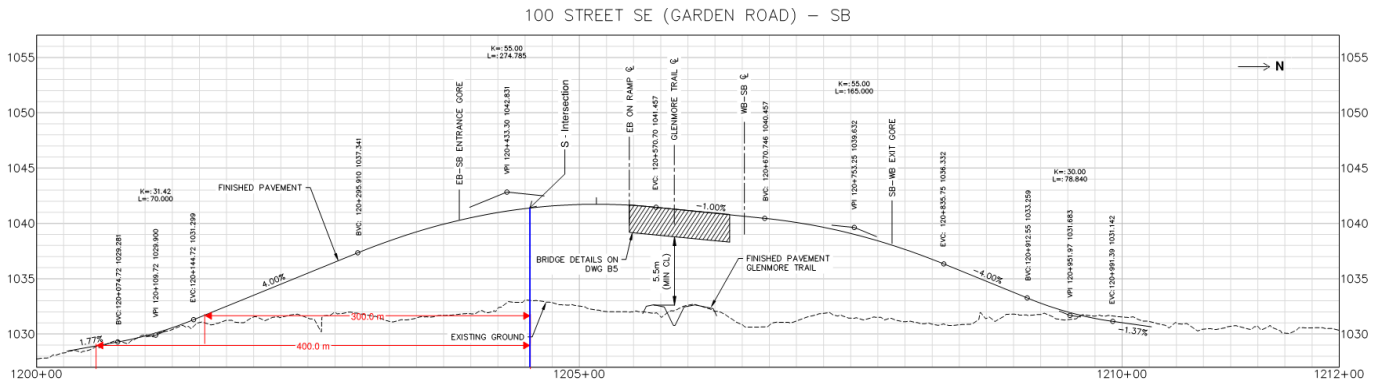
100 Street SE (Garden Road) Proposed Southbound Road Profile
